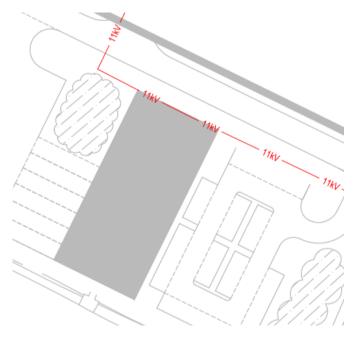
Existing SSE HV apparatus and proposed STE-02 building
